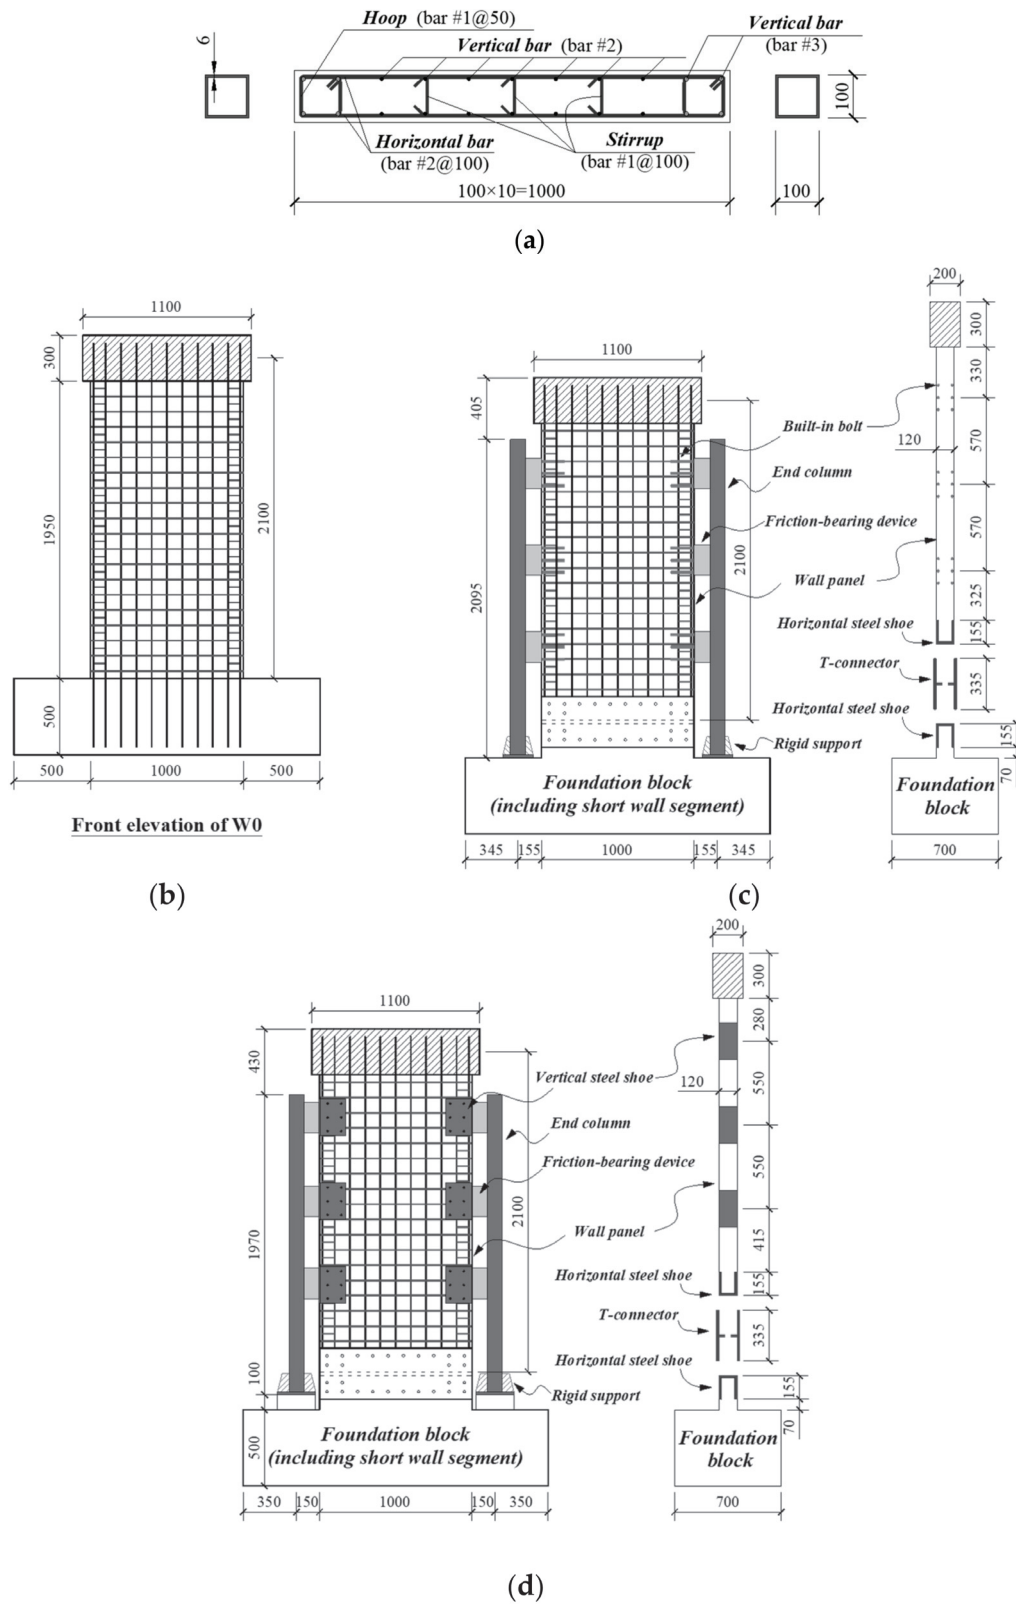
Details of walls (unit: mm). (a) Cross section of PC shear wall; (b) W0; (c) W1-R; (d) W2-R.
